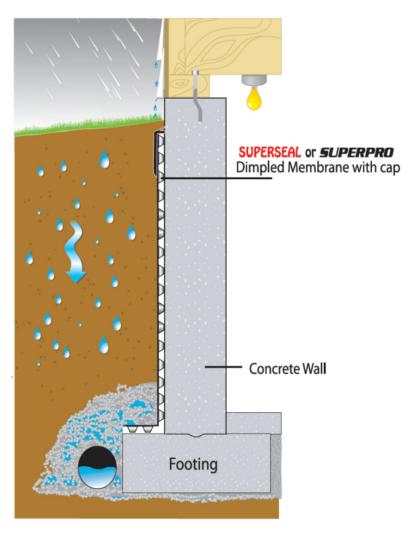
TYPICAL MEMBRANE INSTALLATION DETAIL
